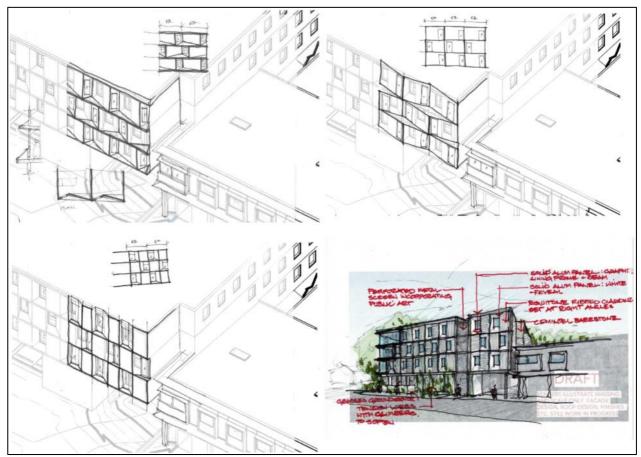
Facade design sketch studies (Team 2 Architects 2021)
